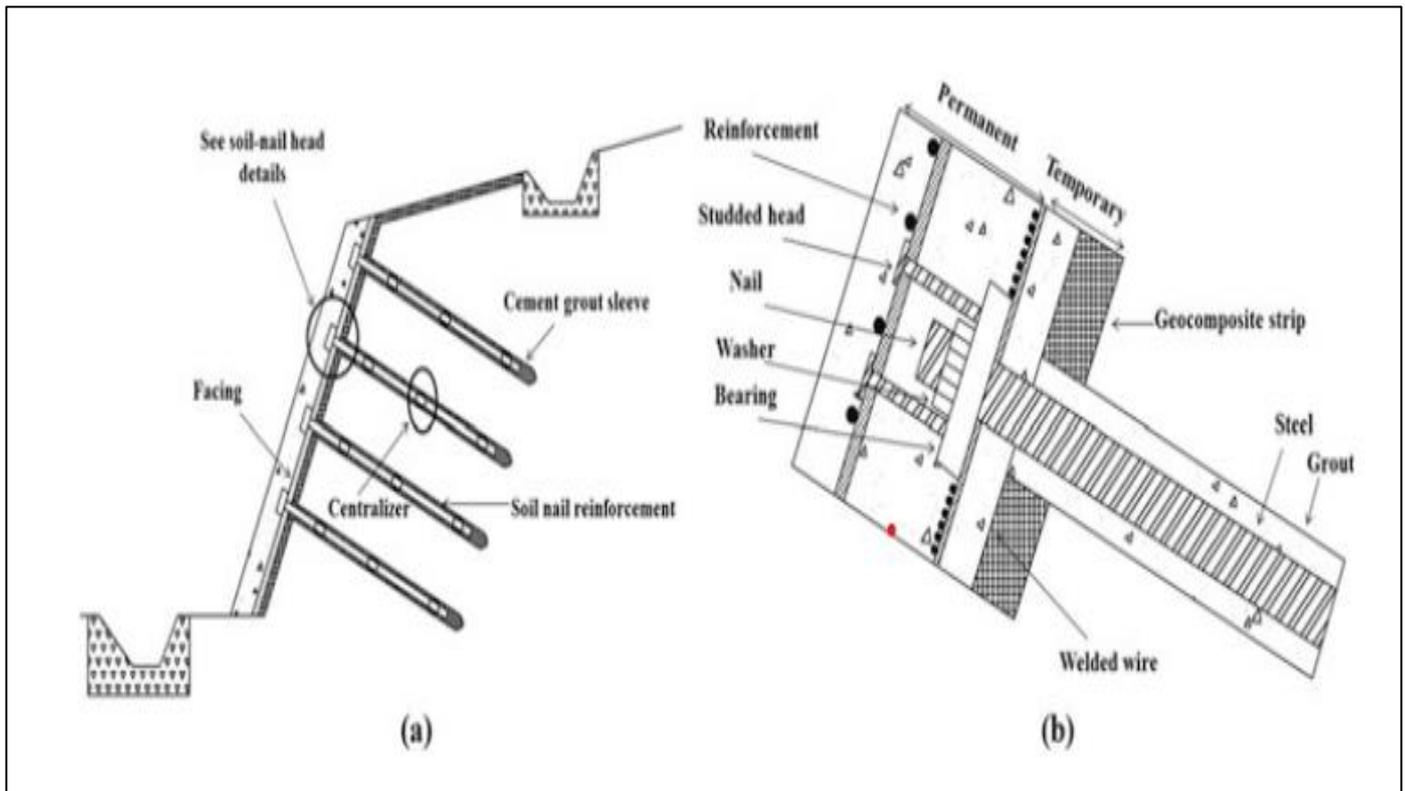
Schematic View of the Soil Nailed Slope (a) Cross Sectional View and (b) Details of Soil Nail Head (Mahesh Sharma, et al 2019)
